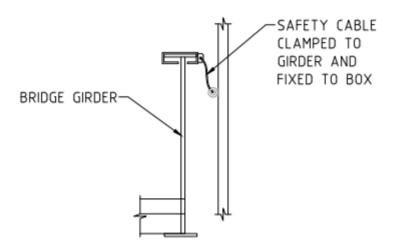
Section of supporting structure (Source: Dennis Bunt Consulting Engineers)
